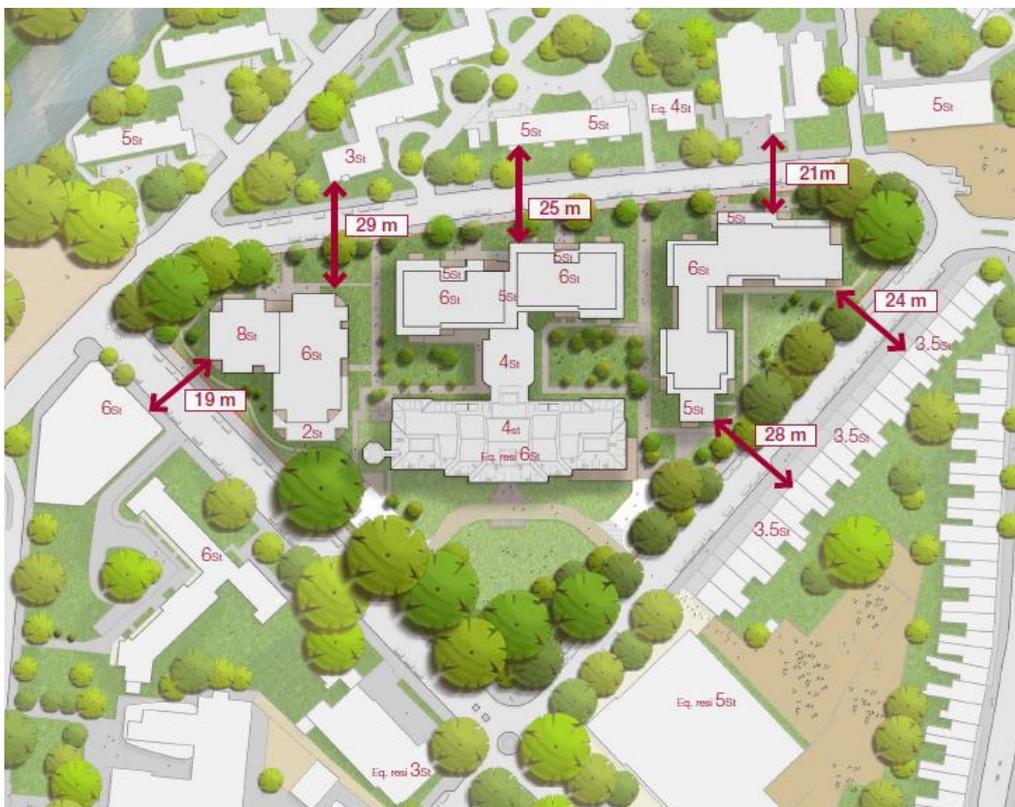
Proposed Building Heights (no. of storeys) and proximity to neighbouring sites
